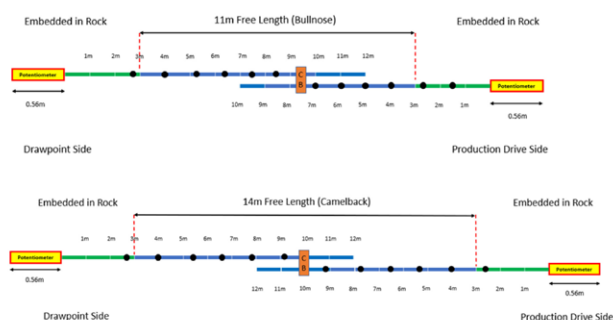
Schematic of SMART cablebolts used to instrument cable slings for the JK-16 instrumentation study: Note that “CB” denotes the planned location of the connector block
